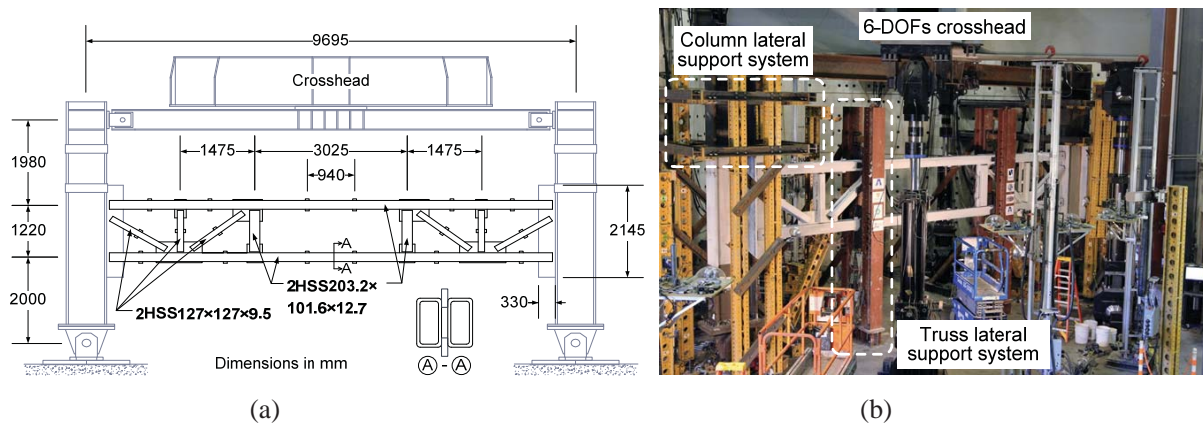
(a) Double-HSS STMF subassemblage overall dimensions (unit: mm) and (b) test setup at MAST
